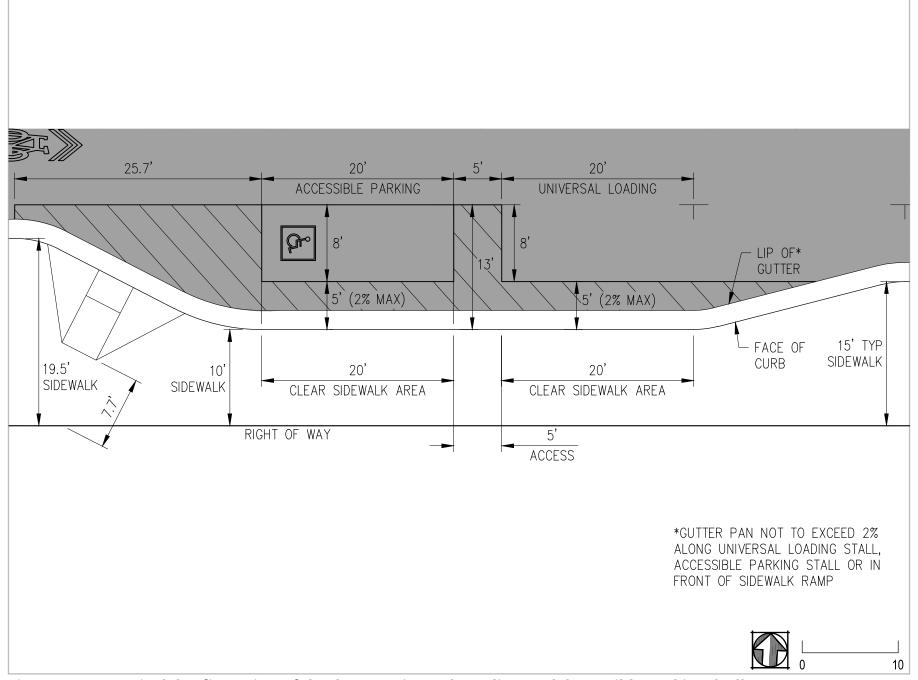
Typical Configuration of On-Street Universal Loading and Accessible Parking Stalls
